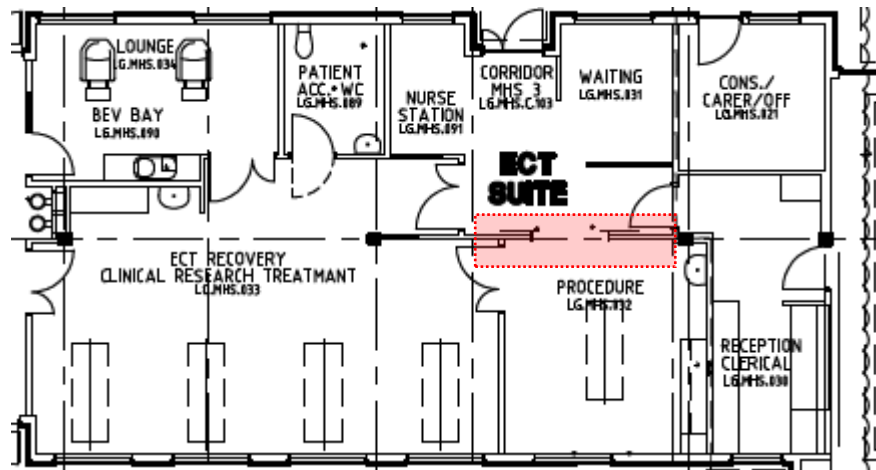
Level LG floor plan showing area of sliding door in patient care areas (adapted from part drawing PSH-AR-MEH-DWG-20LG100)
